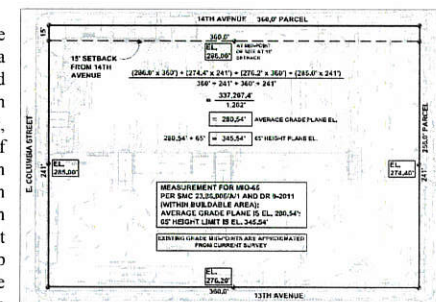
Height Calculation for 1313 East Columbia Site (north is to the left)
